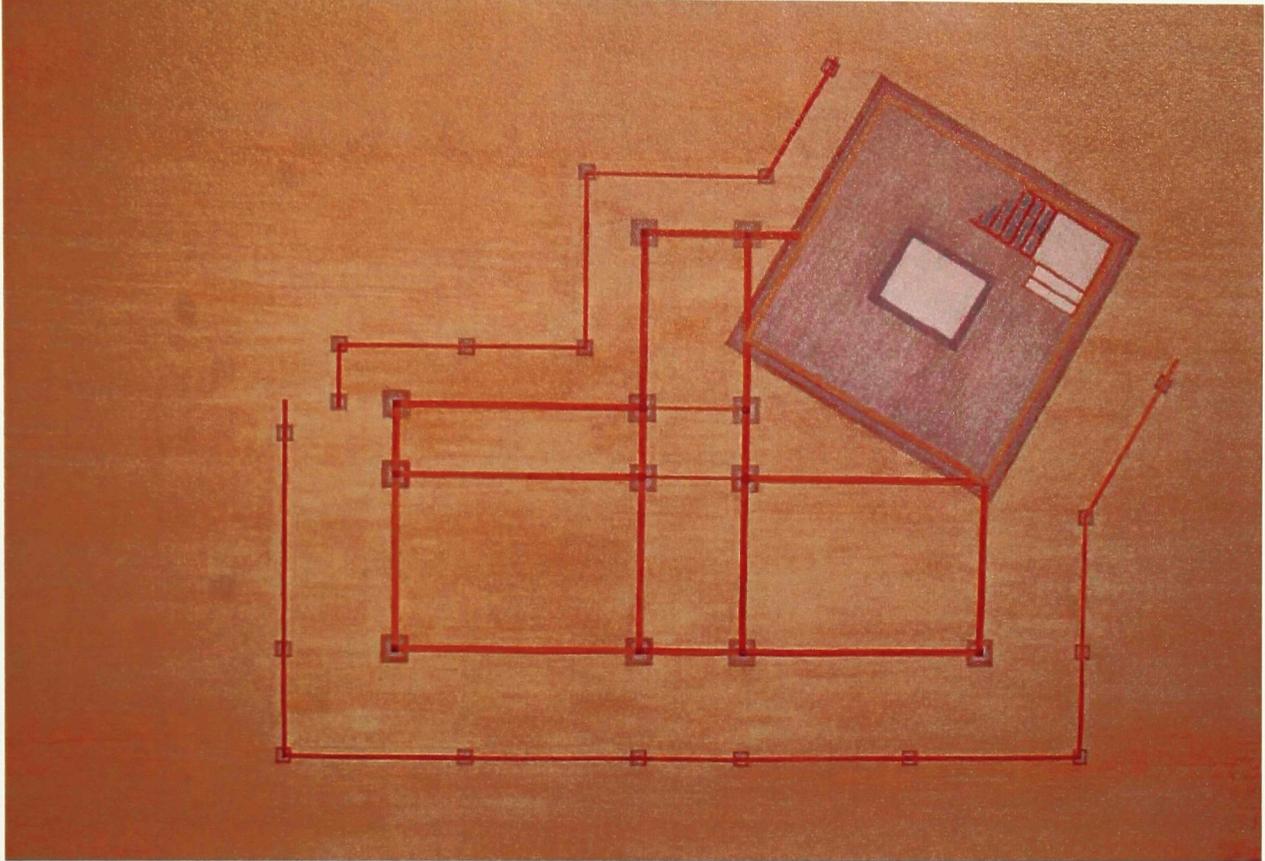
Plan: Foundation (full and piers) of Year Round Tree House Home
